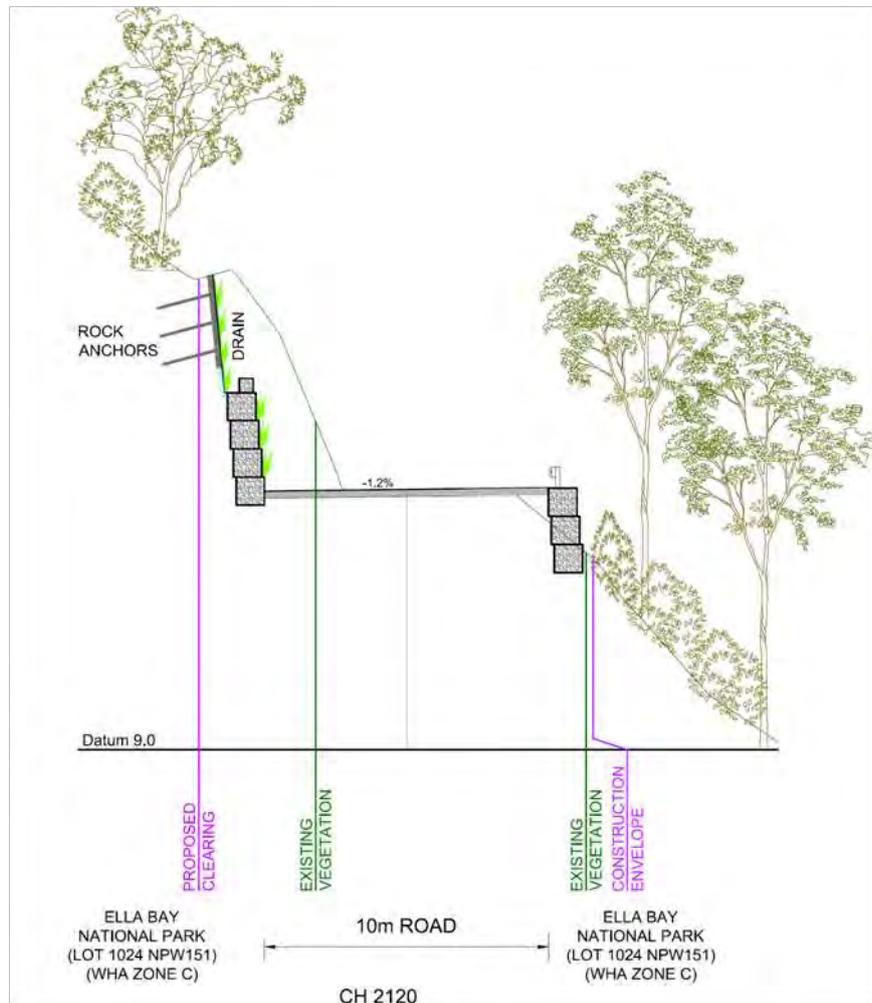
8 Typical western drain for gabion structures at Heath Point. (this section of road is superelevated for safety).
